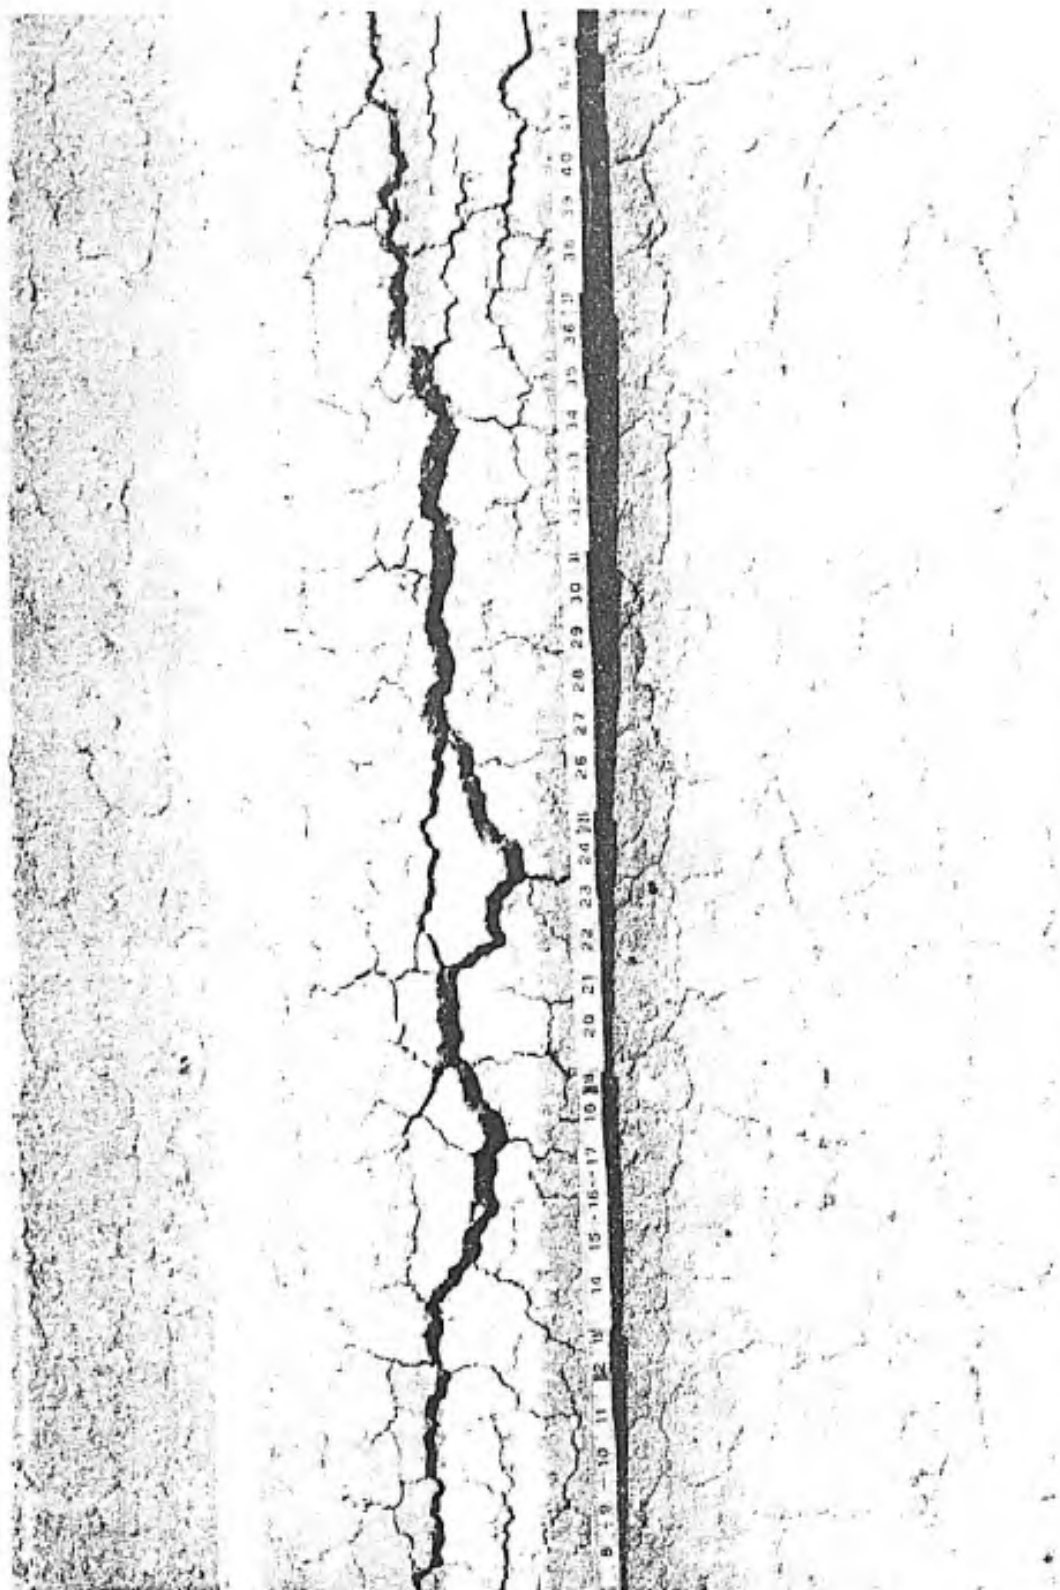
Close up of longitudinal Fatigue Crack located in the F-15 Traffic Lane.
